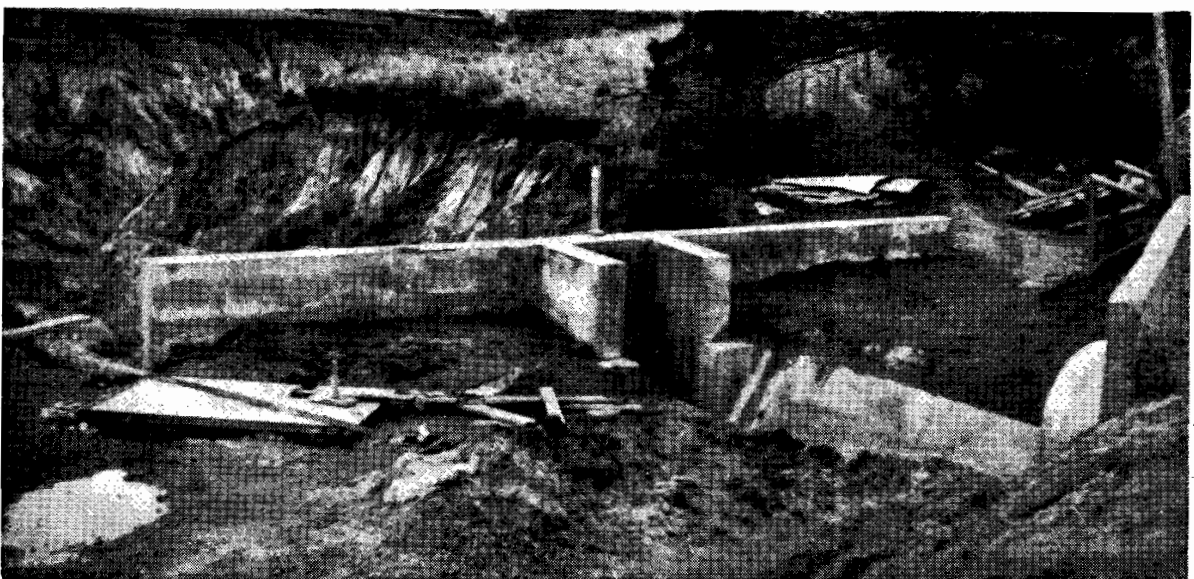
Scour prevention drop structure on Caramut-Glenthompson Road.
